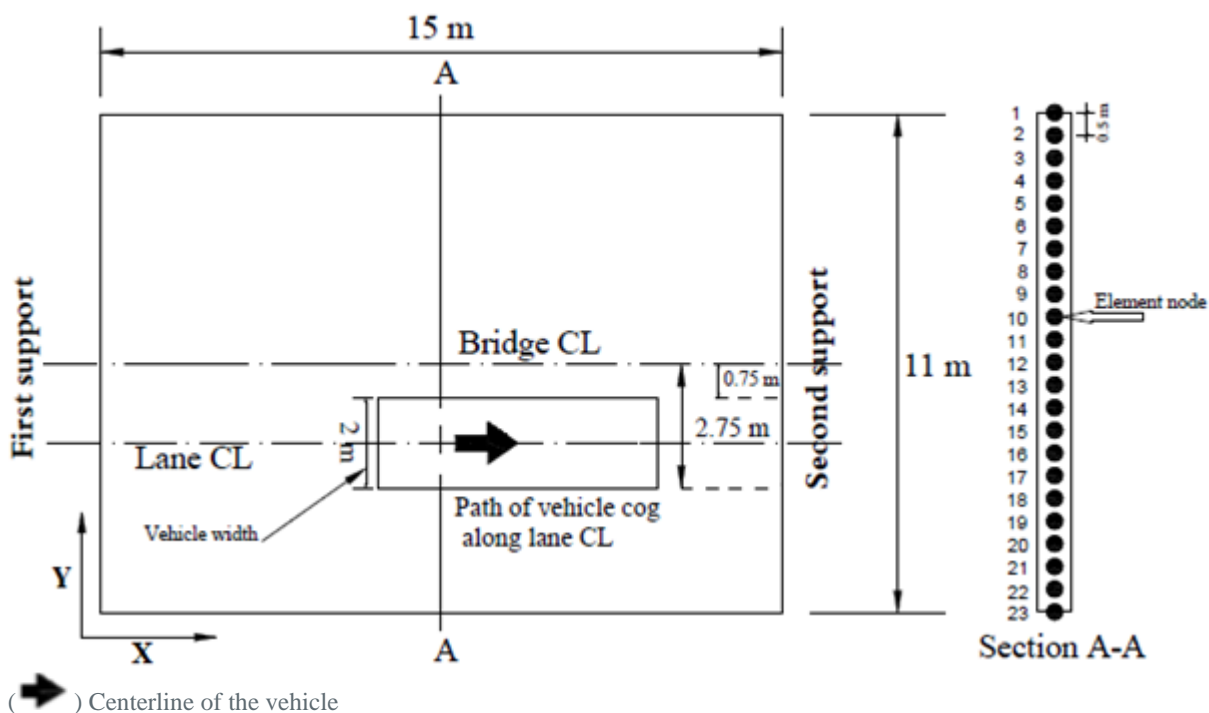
Plan view showing location of vehicle paths on bridge plate model
